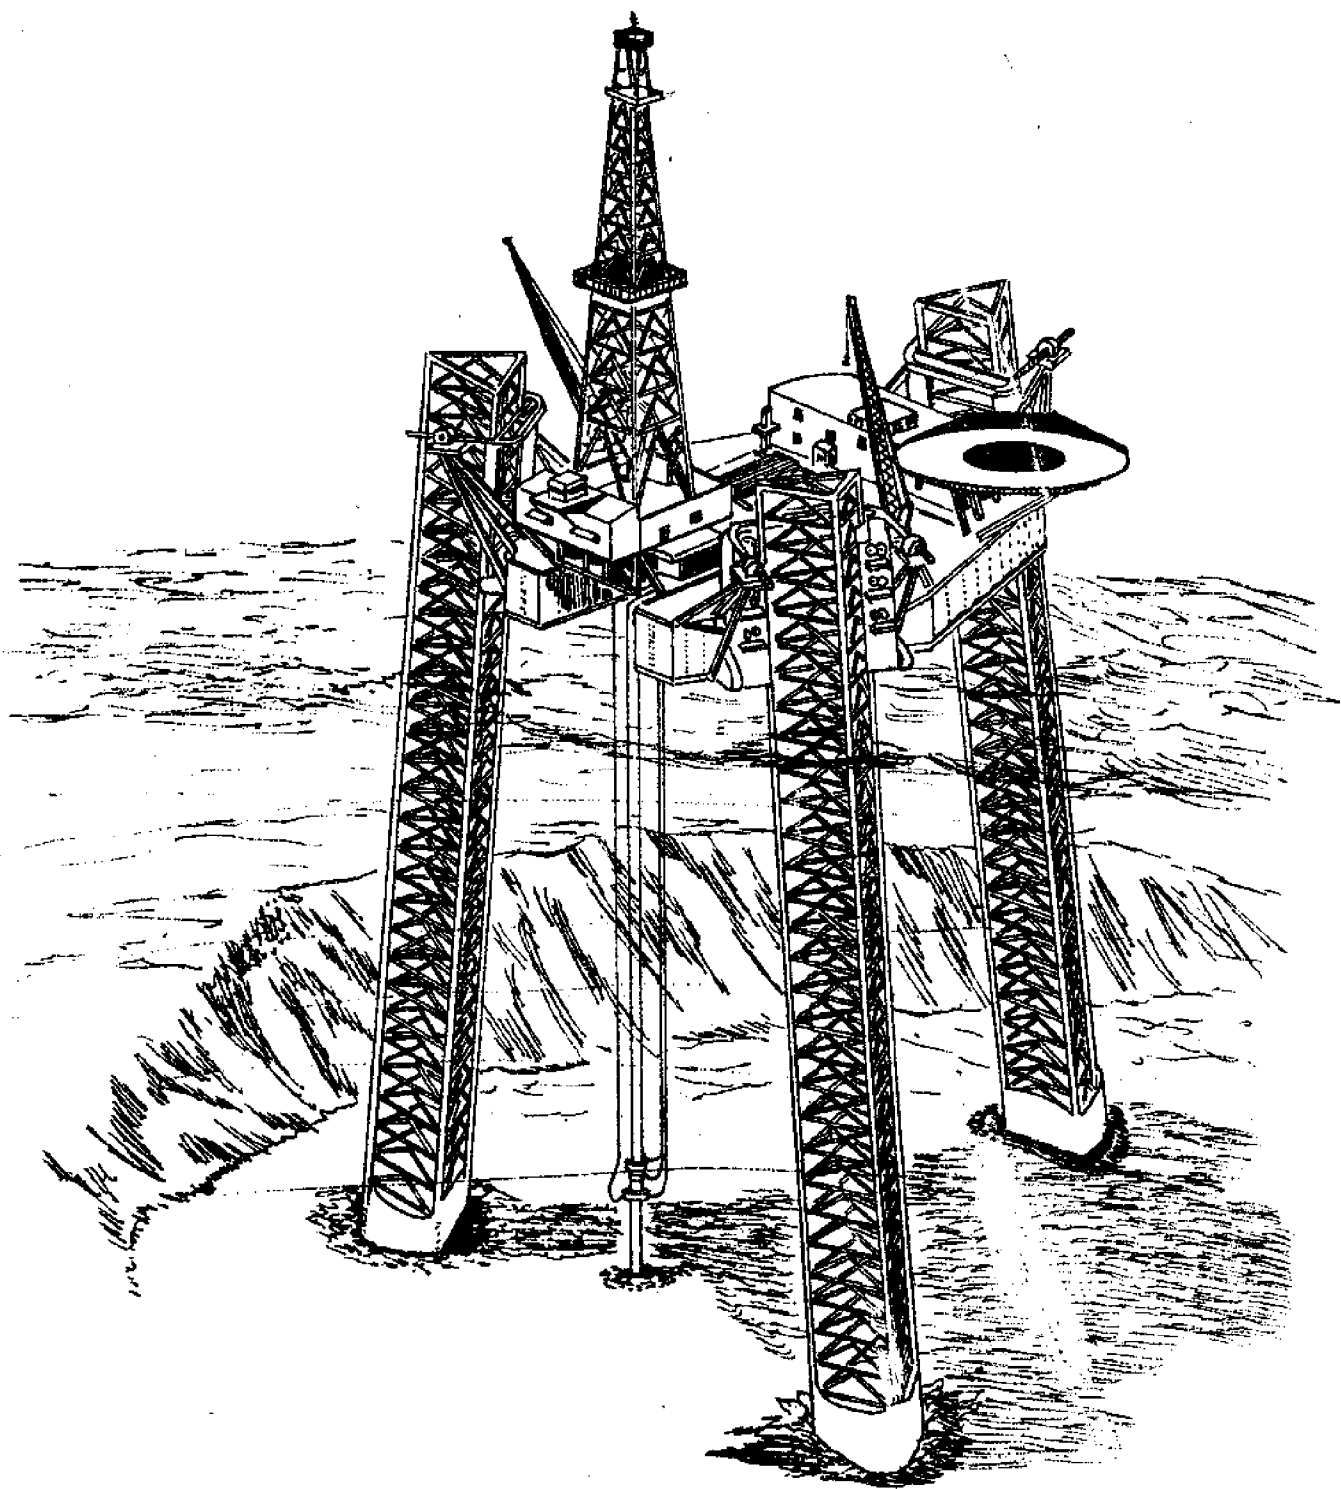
JACK-UP TYPE OIL DRILLING PLATFORM.
